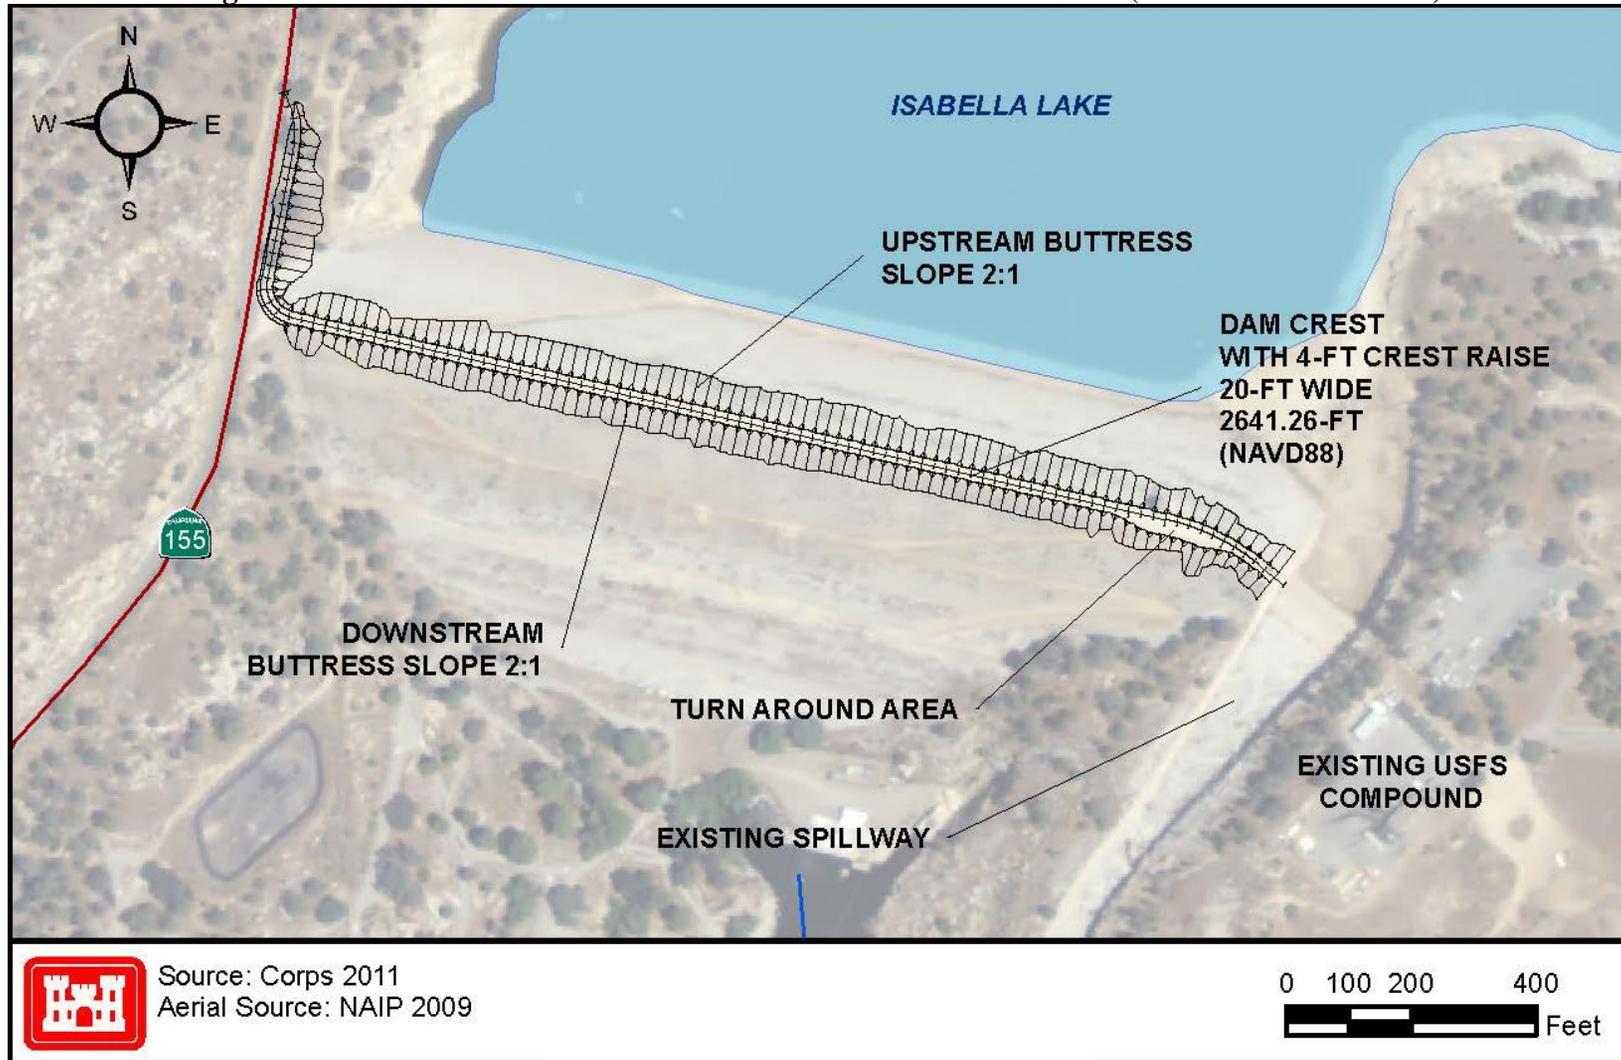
Plan View Sketch of Main Dam with Filter Near Crest (Alternative Base Plan)
